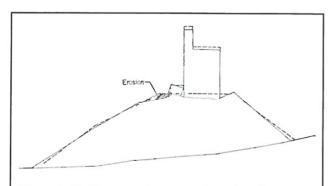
Cross-section survey by video, Santa Cruz de la Palma Breakwater, Spain (Ligteringen 1996).
